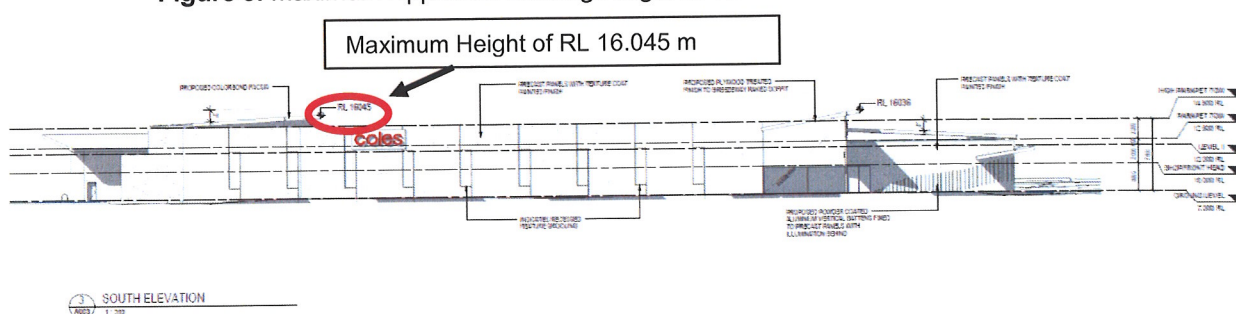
Maximum Proposed Building Height as Identified on the Southern Elevation
